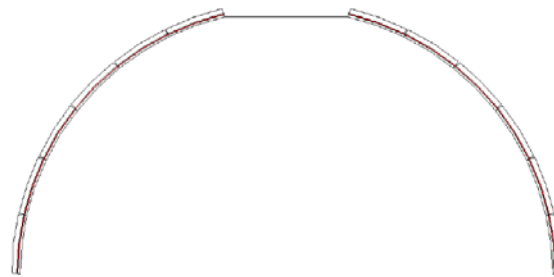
Cross section in the final position after the elevation. (Source: [22])
